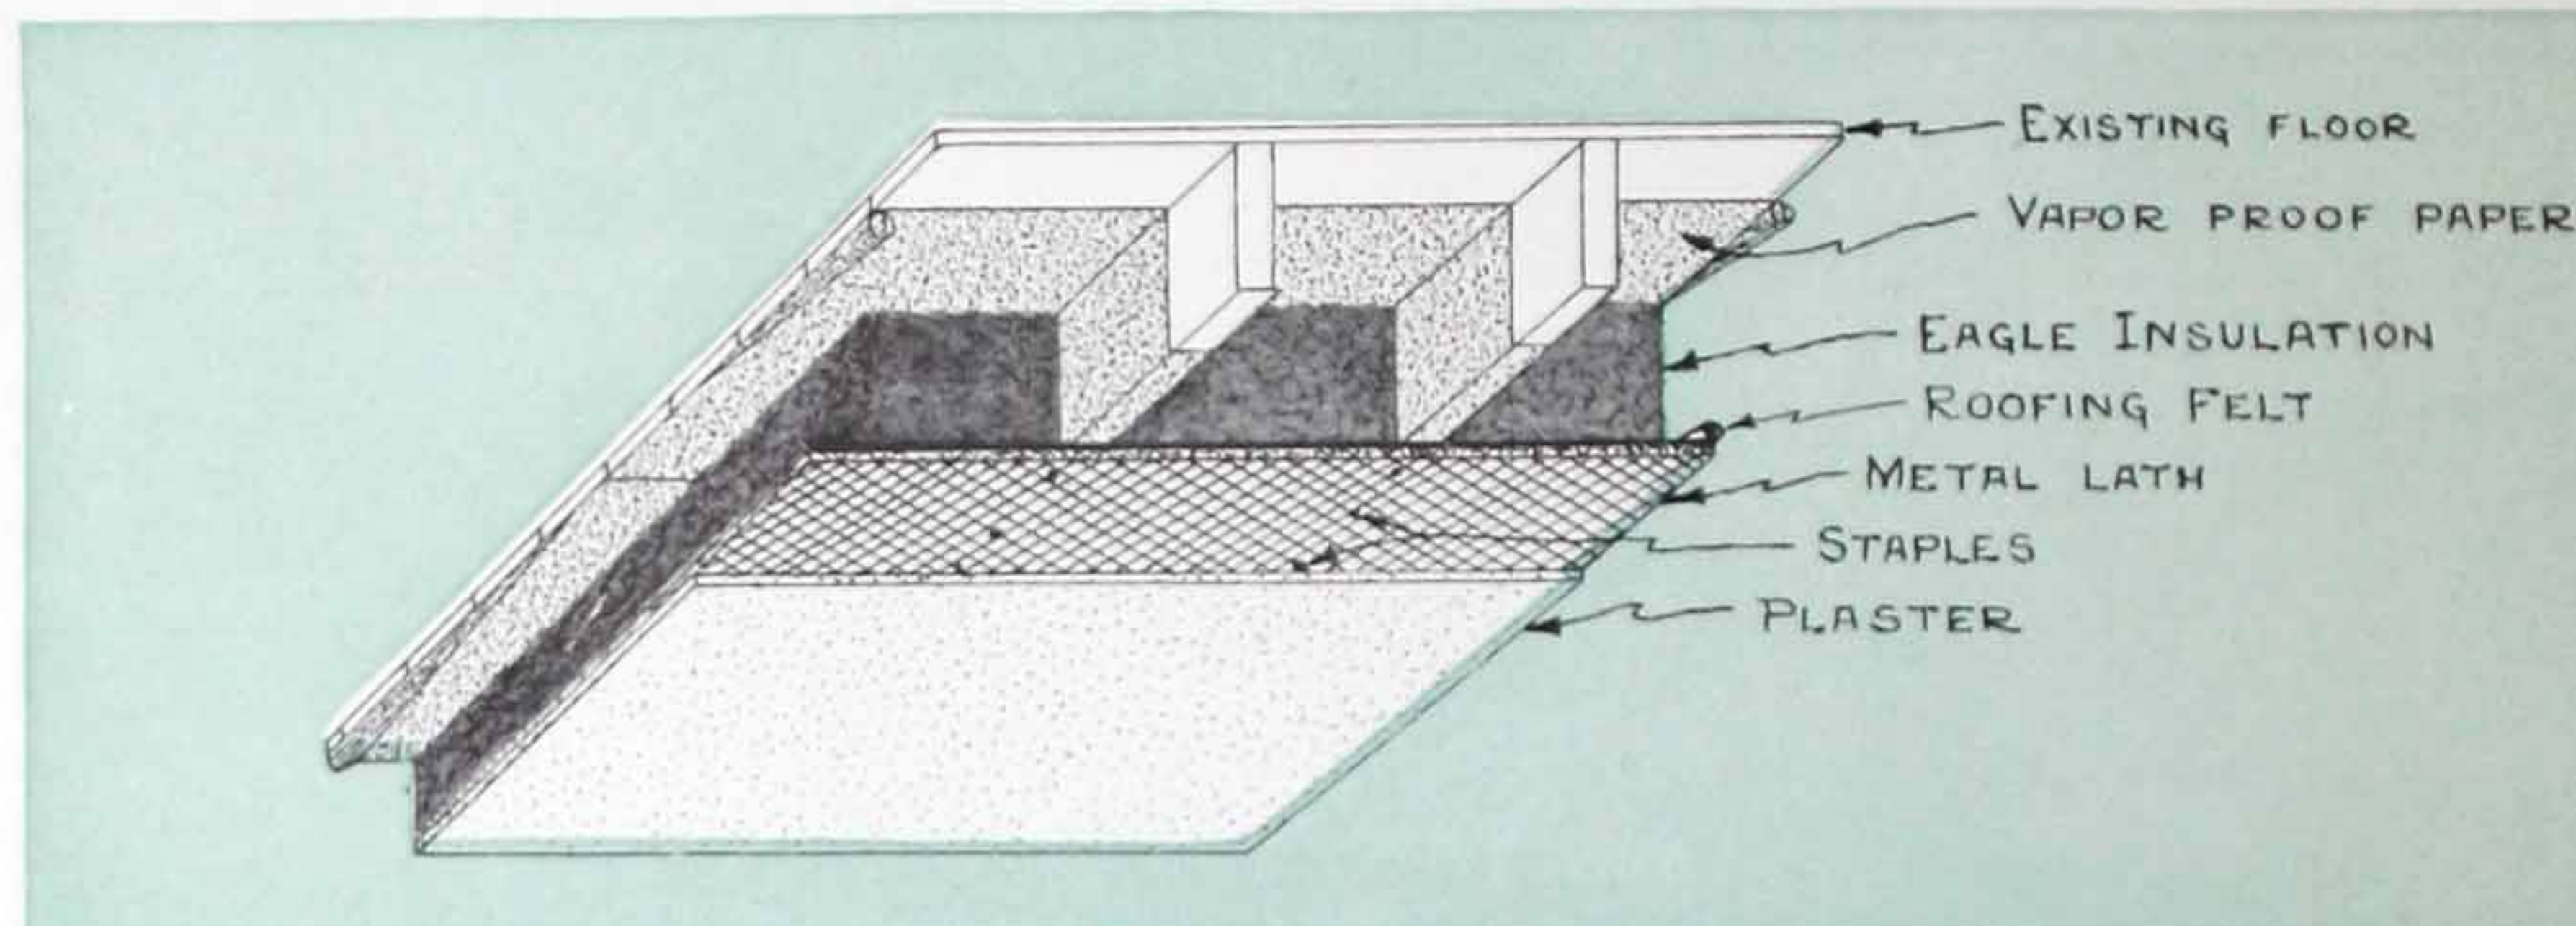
Details of application of Eagle Insulation to existing ceiling.
